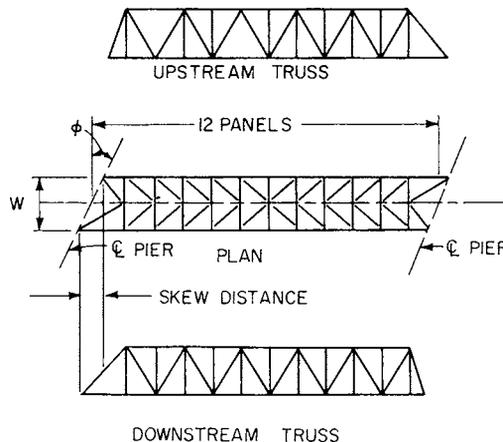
Skewed bridge with skew distance less than panel length.
